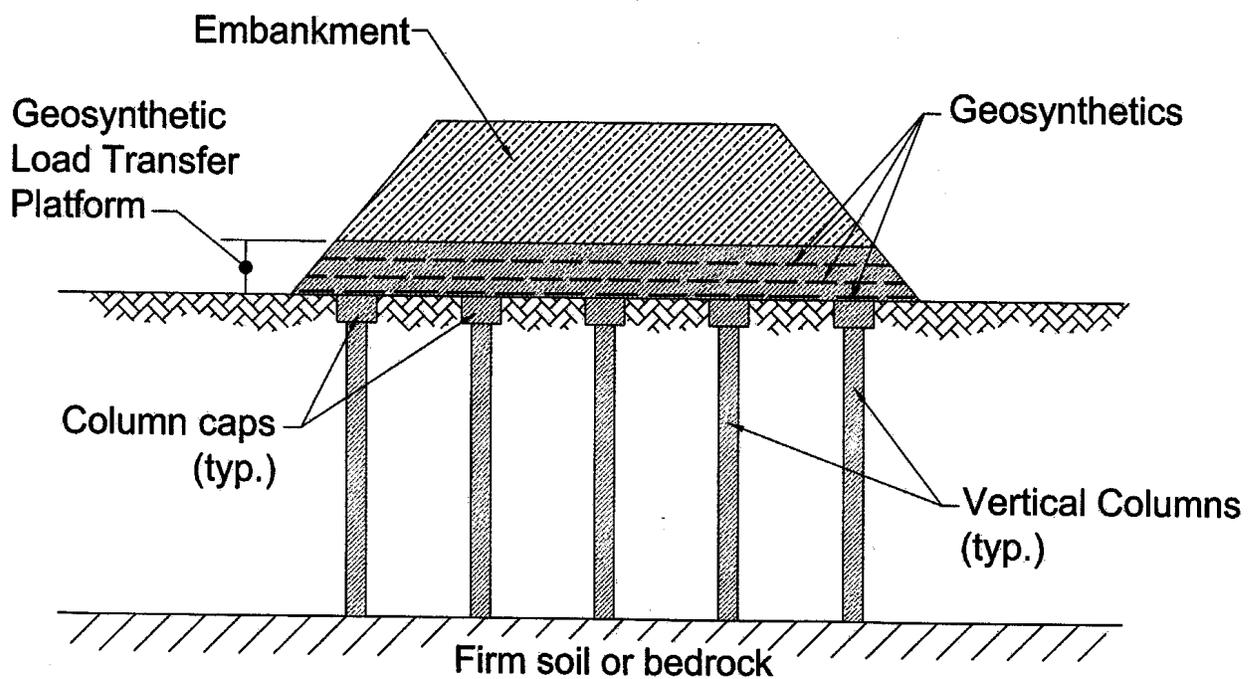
Column supported embankment with geosynthetic reinforcement.
